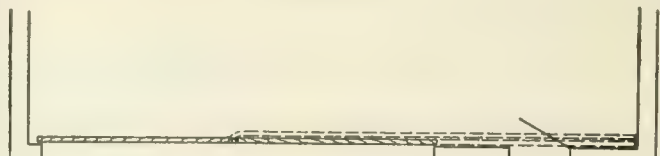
Doors Slide on Parallel Tracks, but when Open, Close Small Door.
